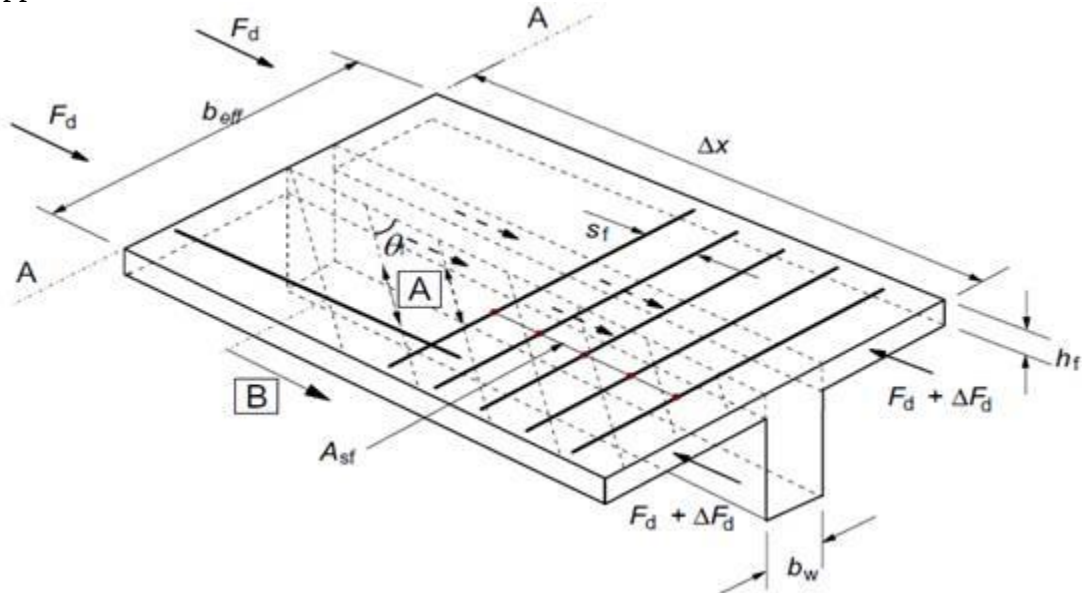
Label, force, and typical reinforcement of a typical T-section
